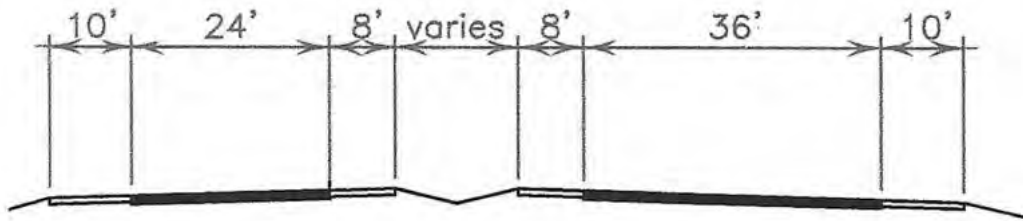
Cross-section view of two approach roadways that are carried across one structure (Example 1)
